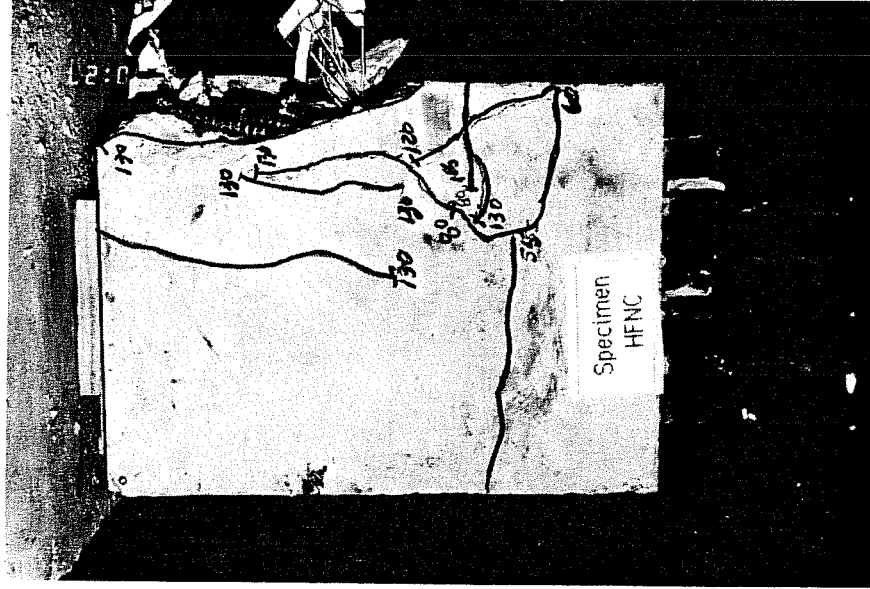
Specimen HFNC at Failure (South and End Faces)
